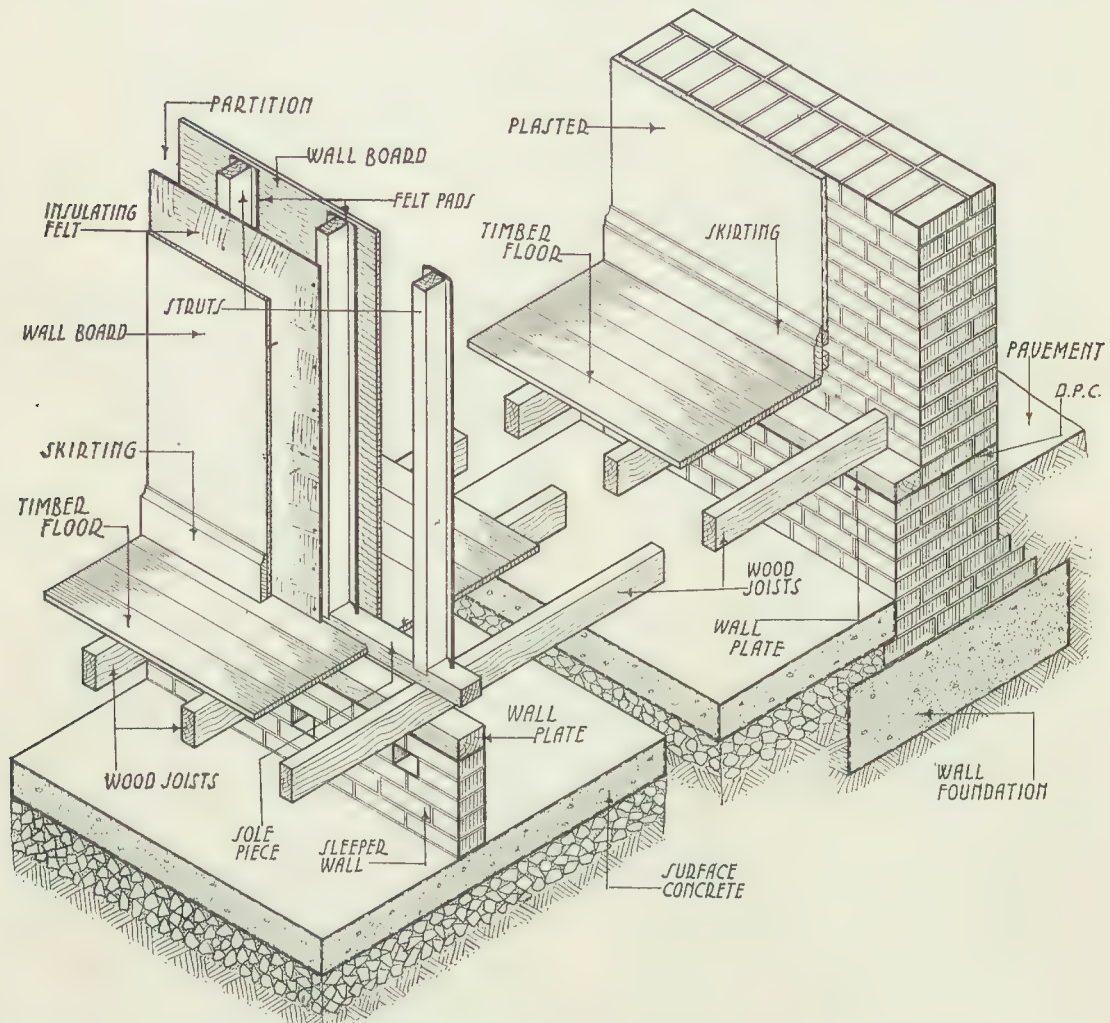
CONSTRUCTION OF TIMBER GROUND FLOOR WITH SLEEPER WALL AND TIMBER STUD PARTITION WALL.
